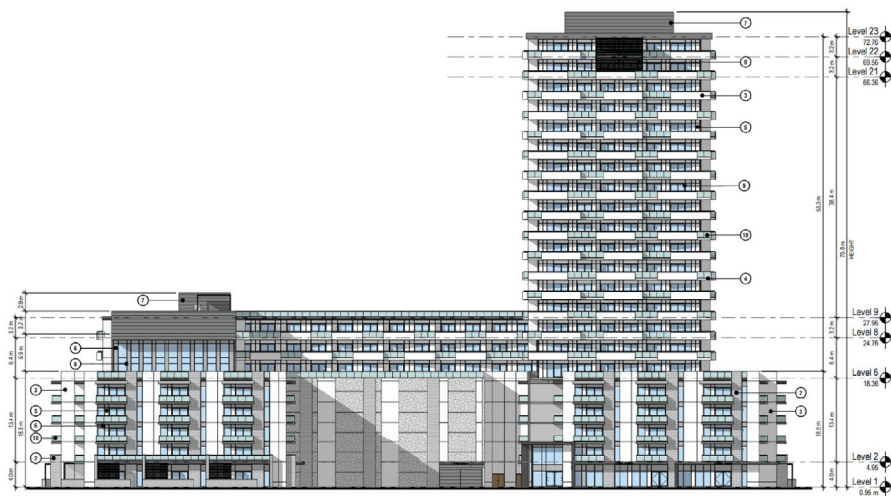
Rear (north) elevations, facing a future public road and low-density residential areas
